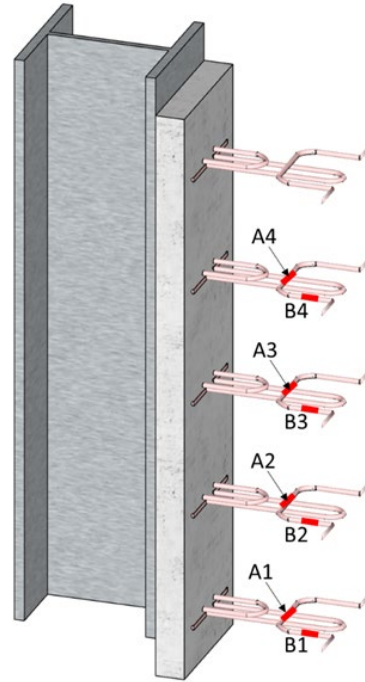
Strain Gauge Locations for SGD Rebar Haunch Detailing
